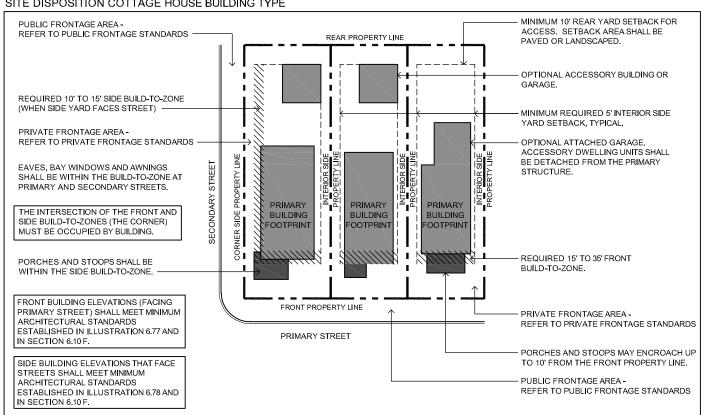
COTTAGE HOUSE BUILDING TYPE
